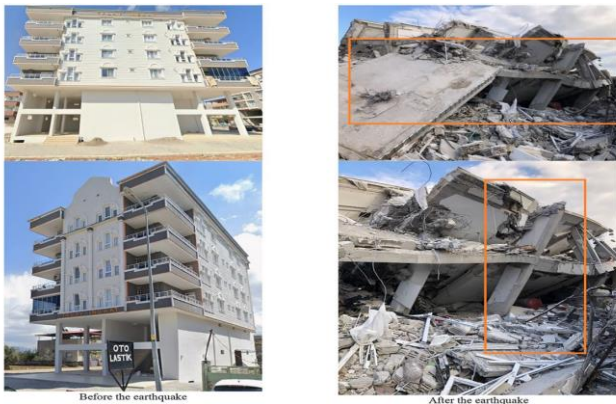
Total structural collapse of a reinforced concrete beamless building with a central core observed after the 2023 Kahramanmaraş earthquakes (Türkiye)
